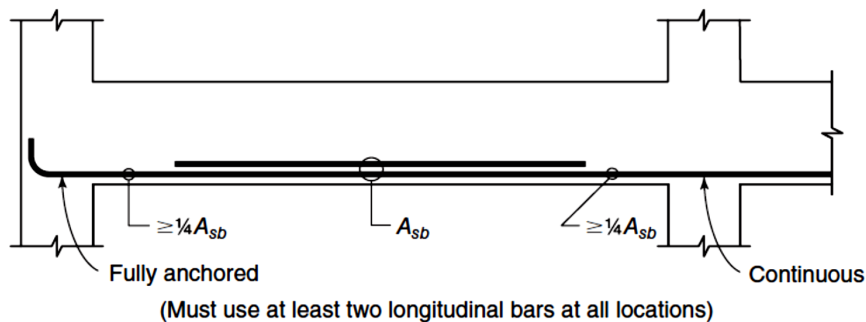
Requirements for longitudinal structural-integrity reinforcement for interior beams framing into columns. (Note: required closed transverse reinforcement not shown.)
